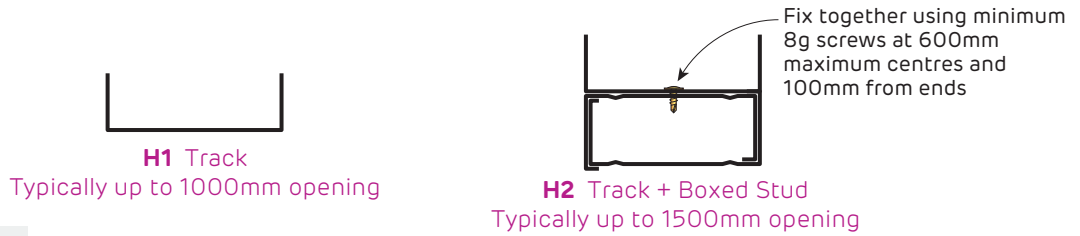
Internal Steel Frame Wall with Window and Door Openings
